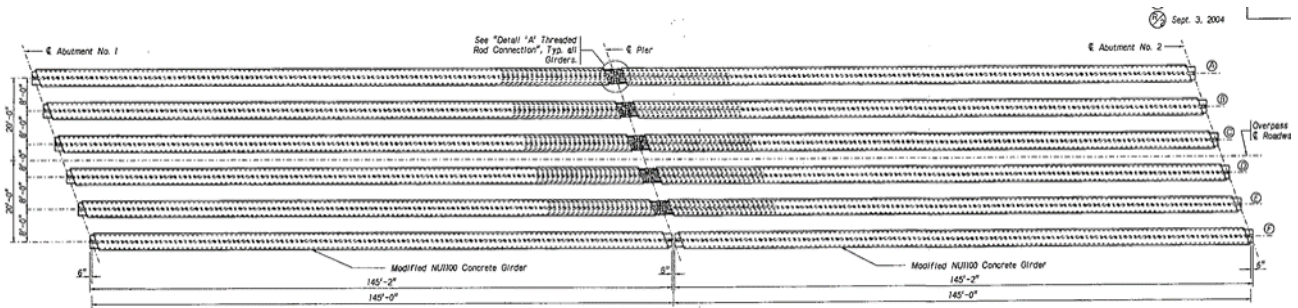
Plan view from the construction documents of Wood River Interchange bridge system, courtesy of NDOT
